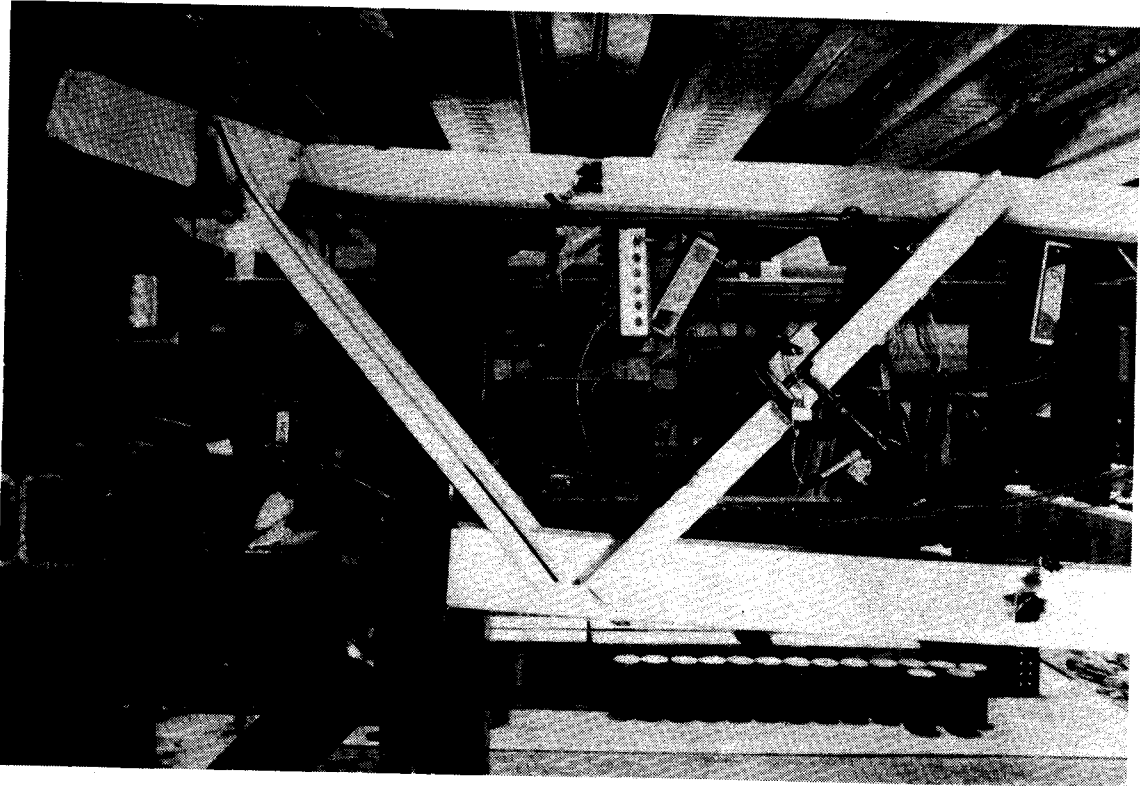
Reinforcement of top chord of truss 2 at maximum load
